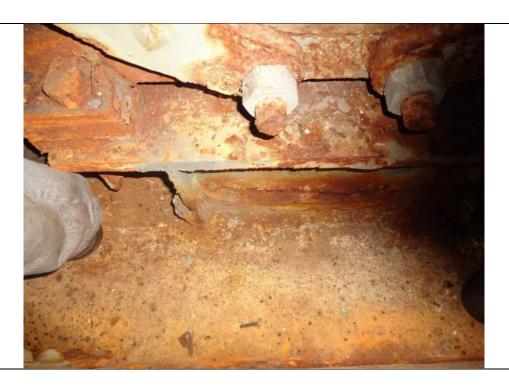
[NW Motor Brake] - Note severe corrosion and section loss on motor brake support.
